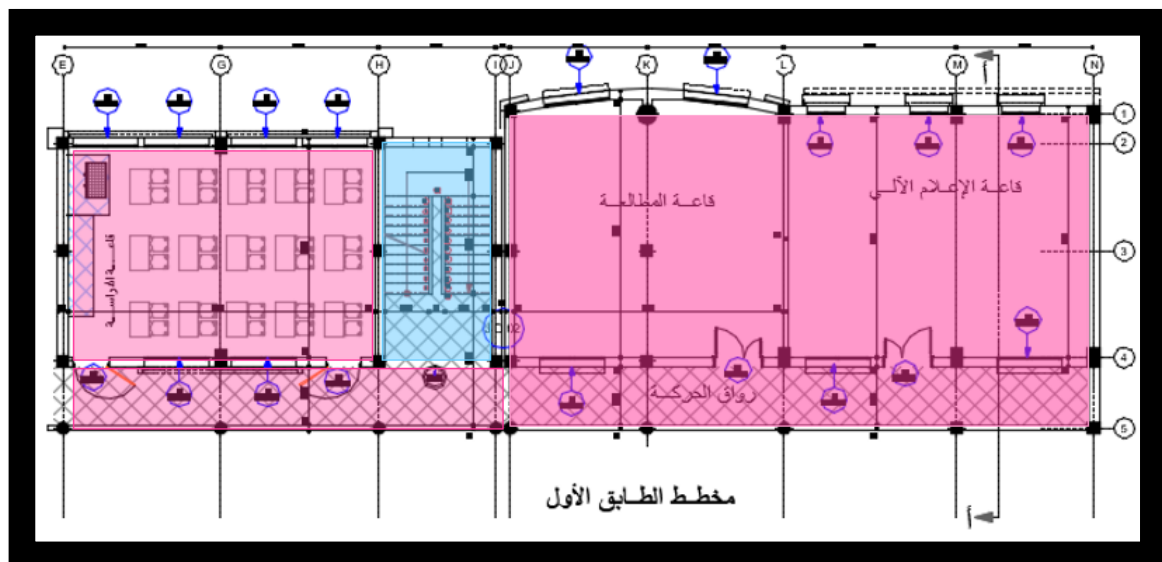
circulation space in the first floor ,Source: first floor plan adapted by the author
